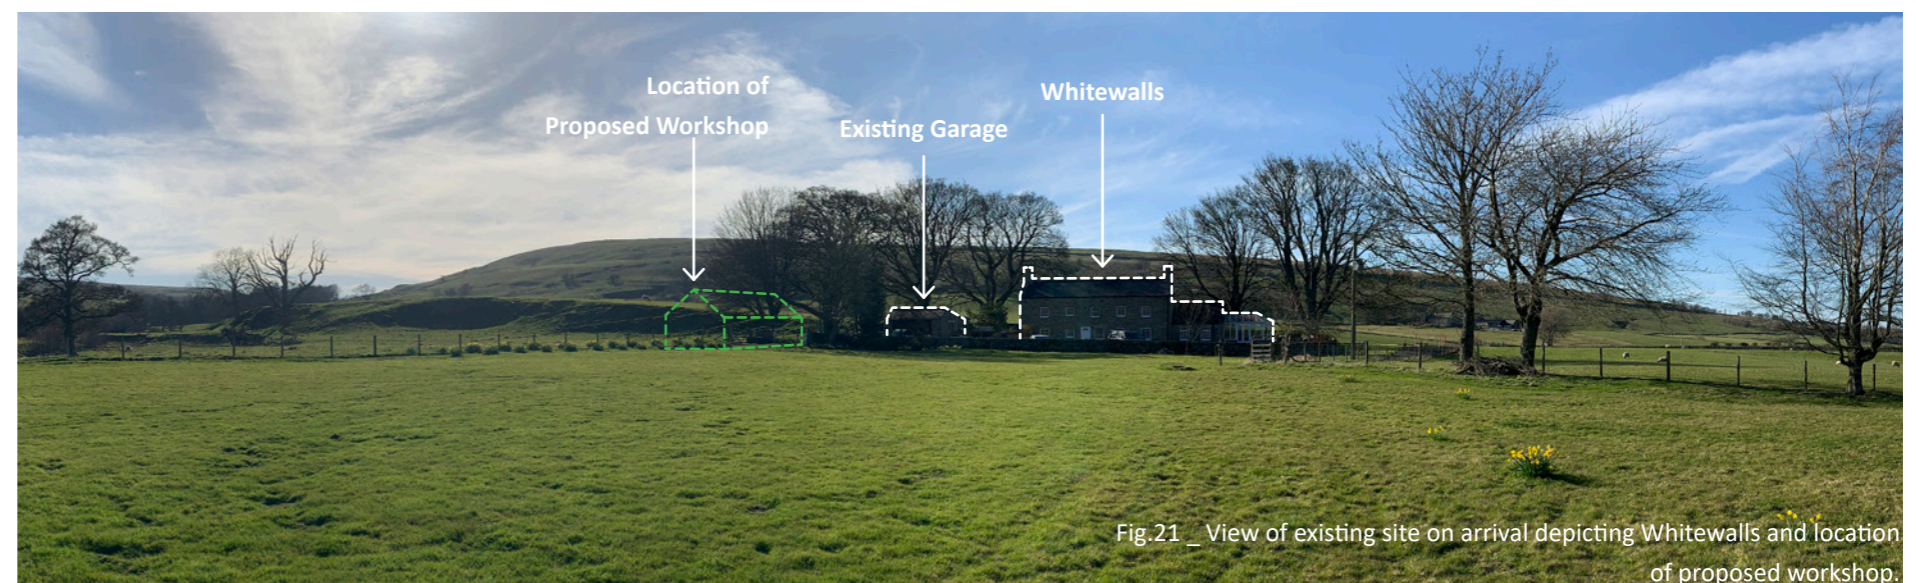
View of existing site on arrival depicting Whitewalls and location of proposed workshop.
